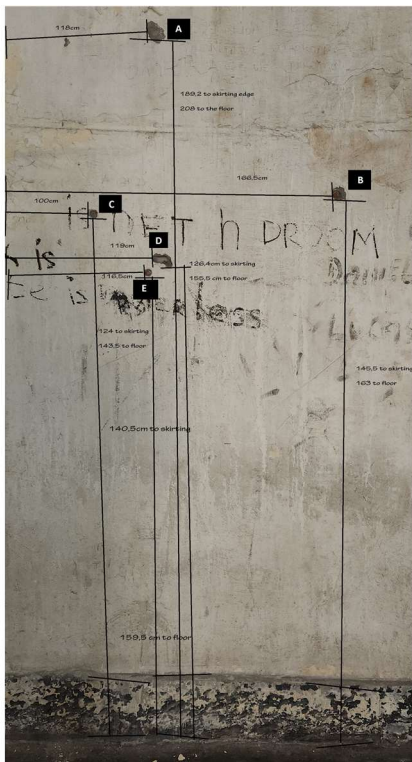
Distance between lacuna on the South wall. 2023. Photograph by the author.
